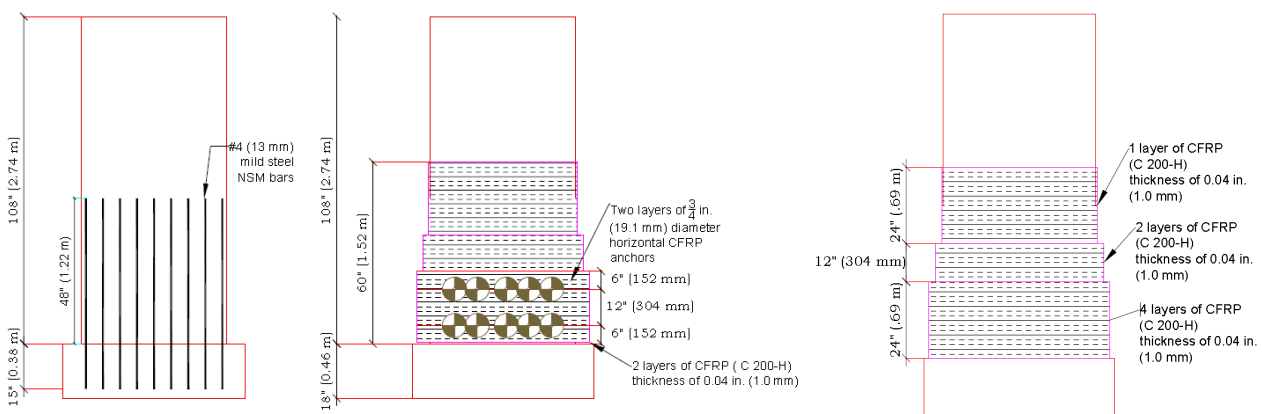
Repair of as-built pier: (a) steel NSM bars (b) horizontal CFRP anchors, (c) hoop direction CFRP wraps
